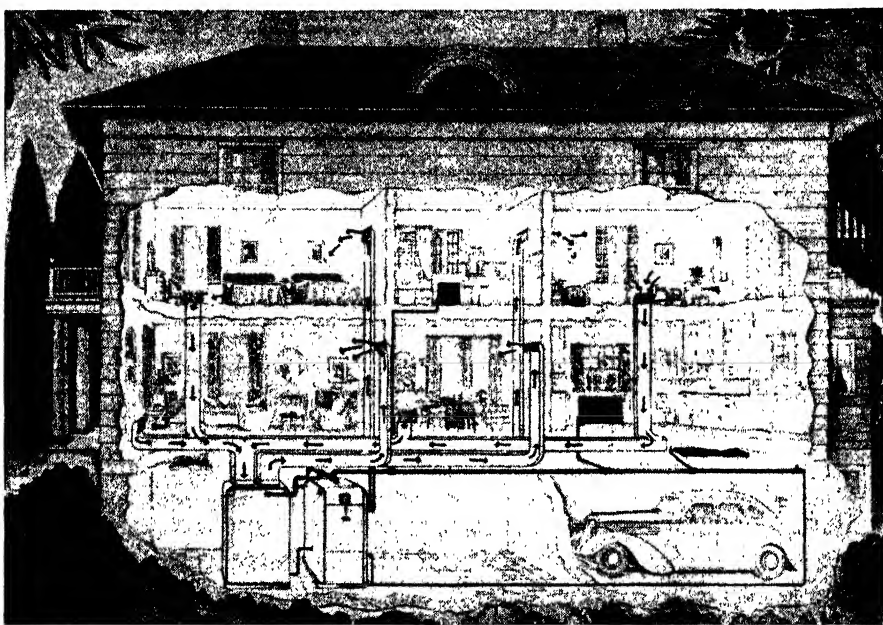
Split system—separate boiler with steam coil in conditioner. (*Fitzgibbons Boiler Co., Inc.*)
